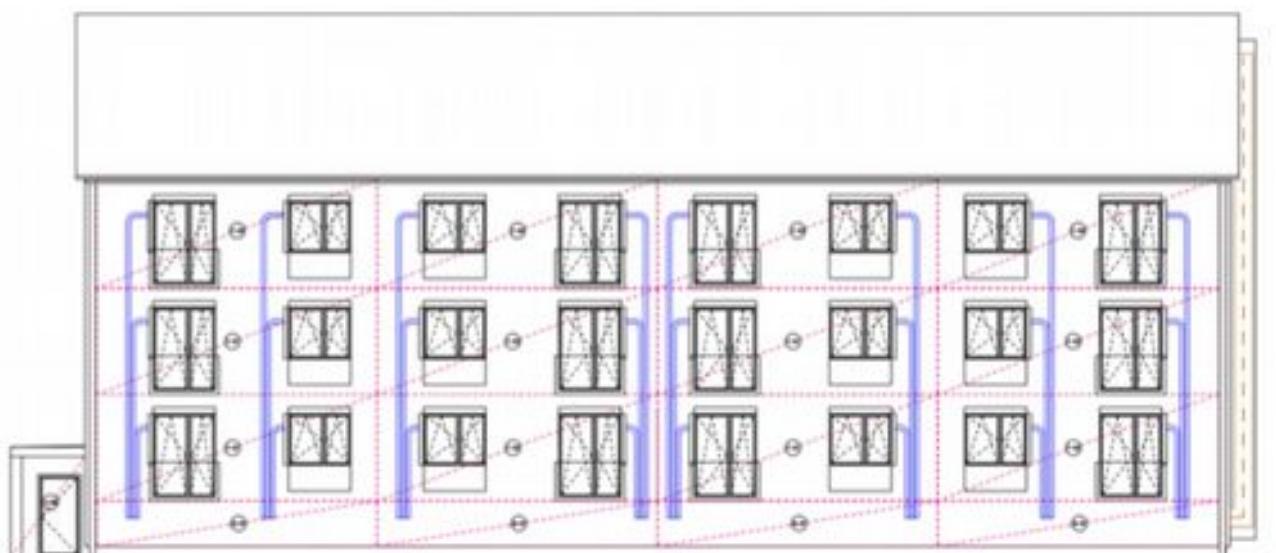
Set of 12 standard panels and 4 plinth panels on the east façade. New prefabricated entrance on the left, new “chimney” encapsulating new HVAC ducts on the right.
